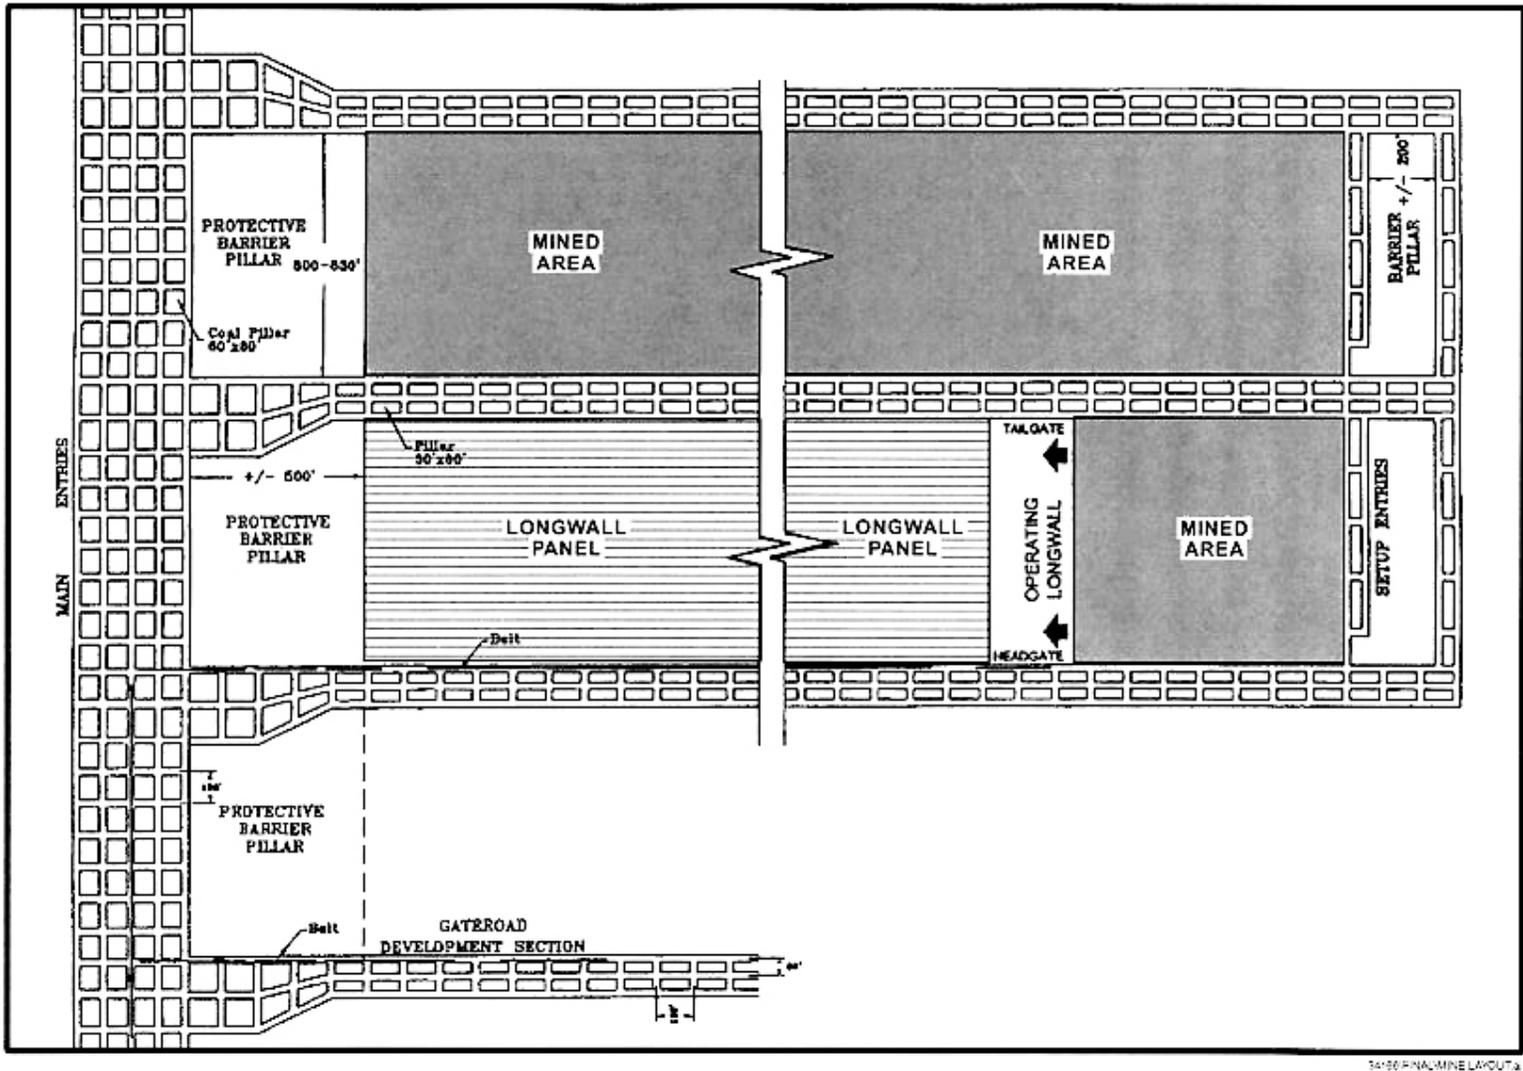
Typical Longwall Panel with Main Entry and Submain Entry.
